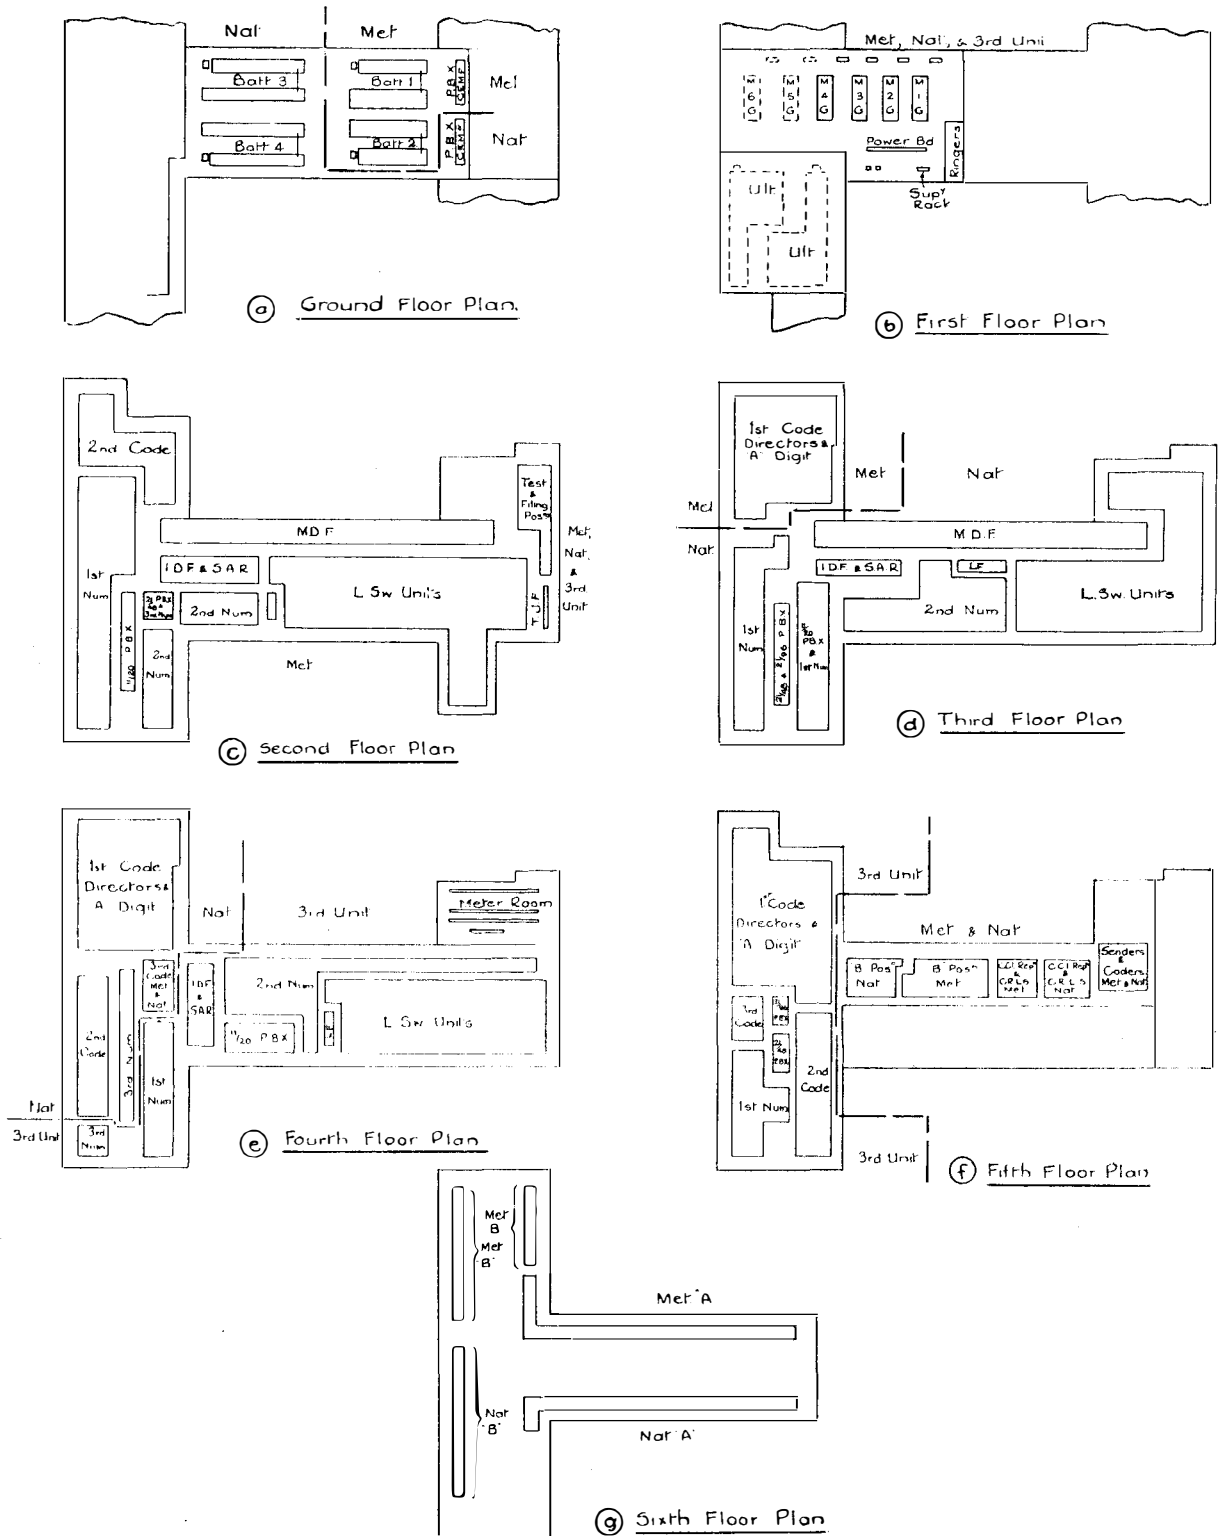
METROPOLITAN AND NATIONAL EXCHANGES. SKELETON FLOOR PLANS.
